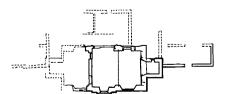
Baconsthorpe Castle, Norfolk. Finished plan from REDM trace.
